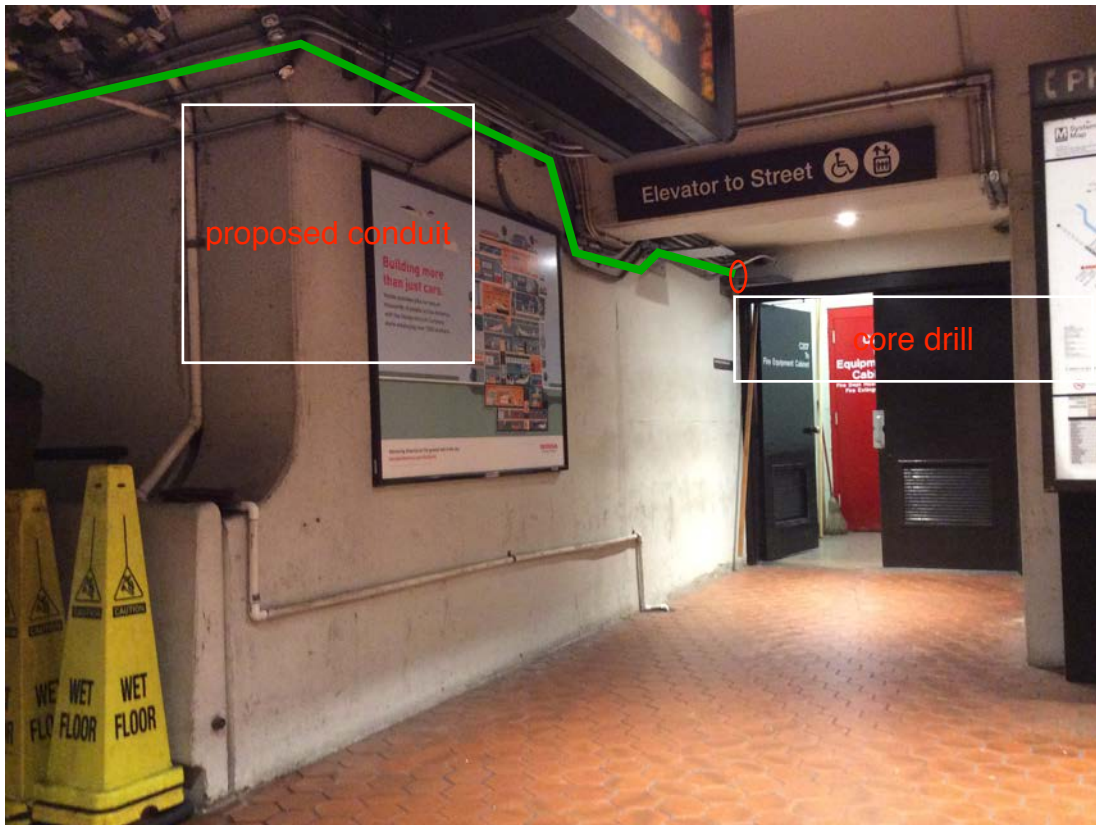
D05 Capitol South: Proposed overhead conduit inside backrooms
